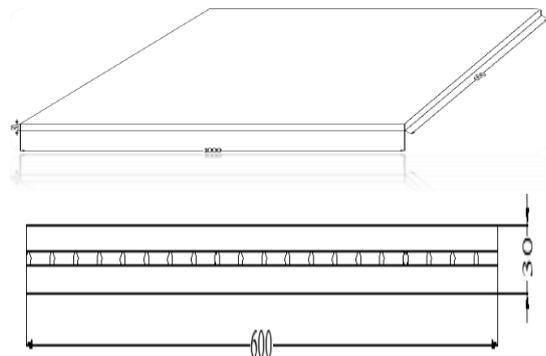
Details of test specimen Table 4.1 details of the specimen
